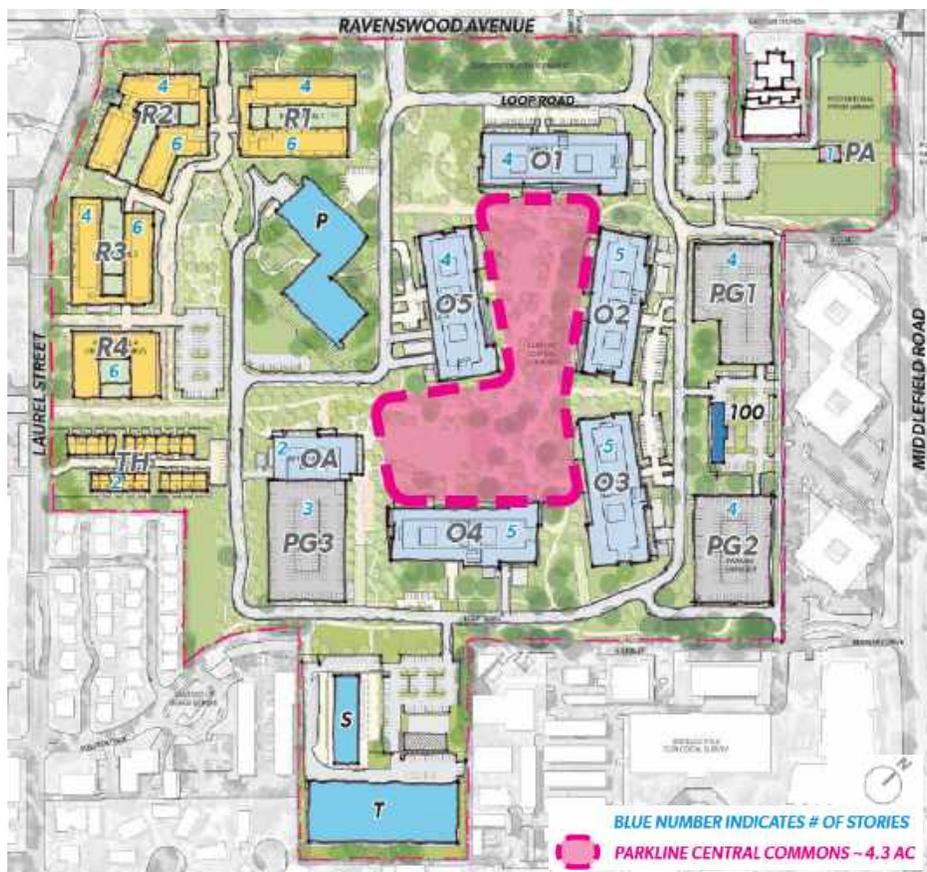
Project Preservation Alternative 1 site plan. Source: STUDIOS Architecture, "Lane Partners Parkline: Historic Resource Evaluation – Site Plan Alternatives: Parkline Central Commons Areas," September 7, 2023. Legend edited by Page & Turnbull.
